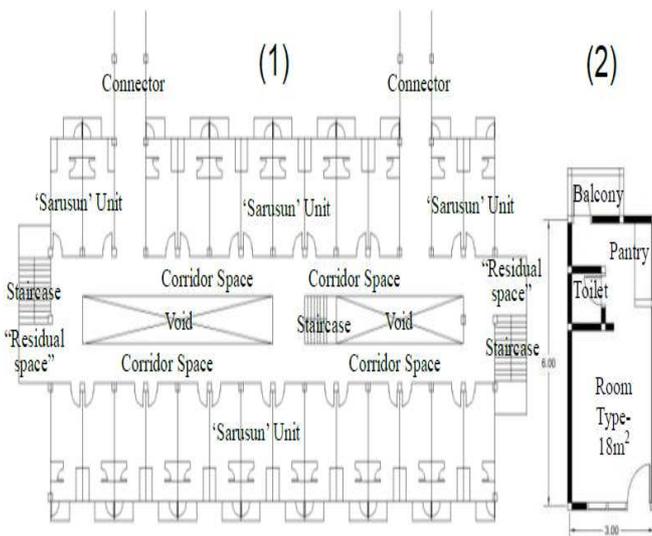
(1) 2nd to 5th Floor plan block "A" building; (2) 'Sarusun' unit floor plan. Source: Private document, May 09, 2016
